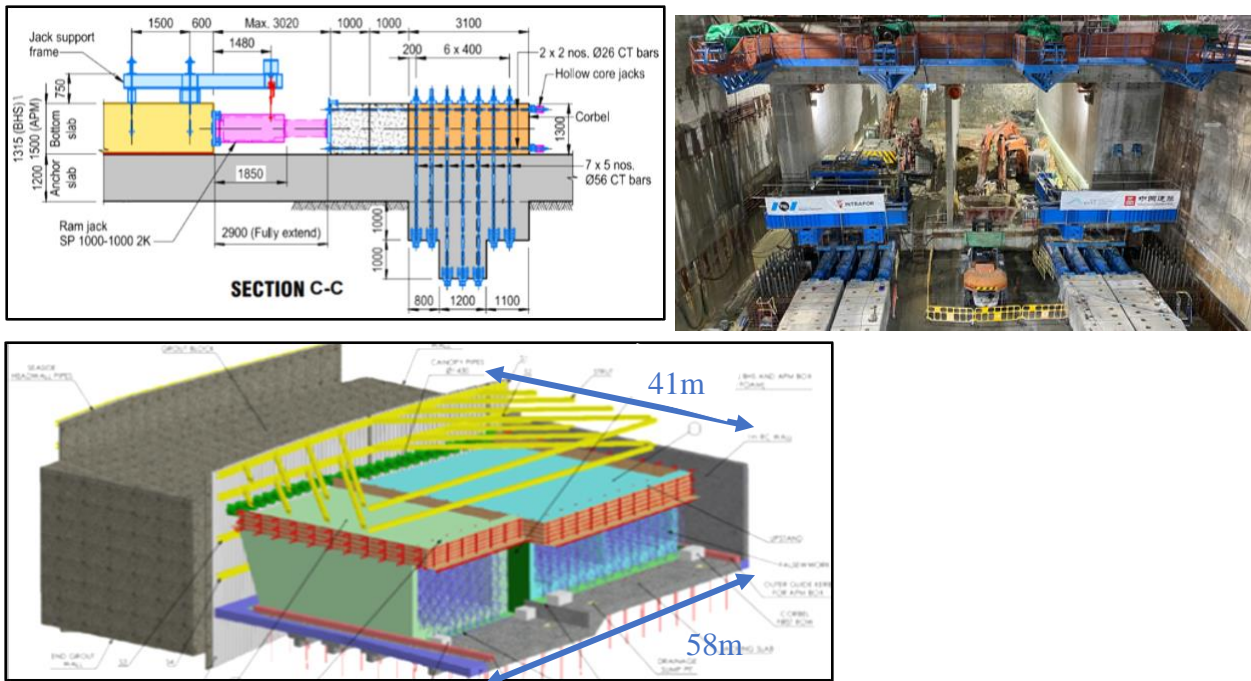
Construction of APM and BHS Tunnel Boxes in Jacking Shaft on top of Jacking Slab
